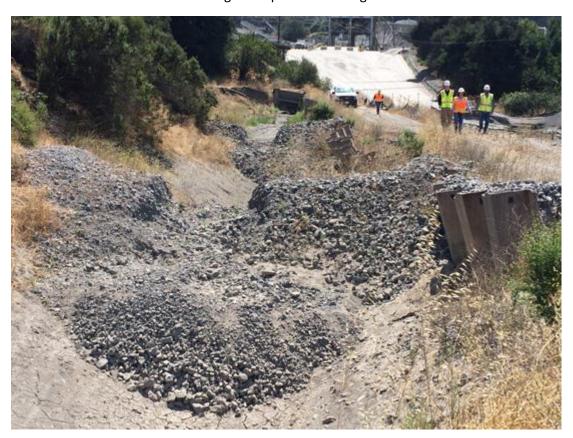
Check dams and failing sheet pile wall leading to Pond 17
